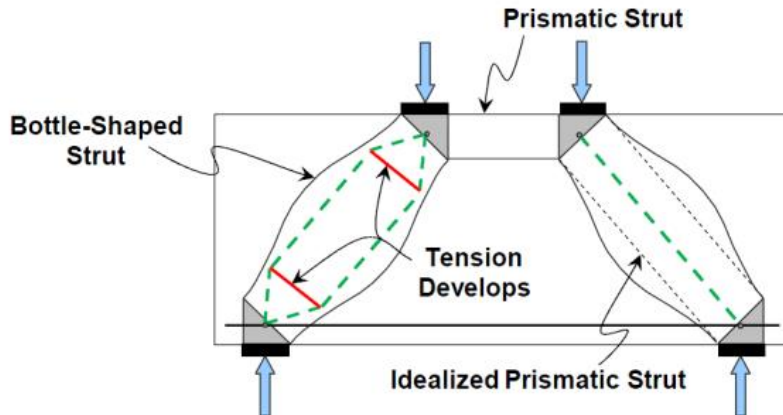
Prismatic and bottle-shaped strut (Birrcher et al. 2009)
